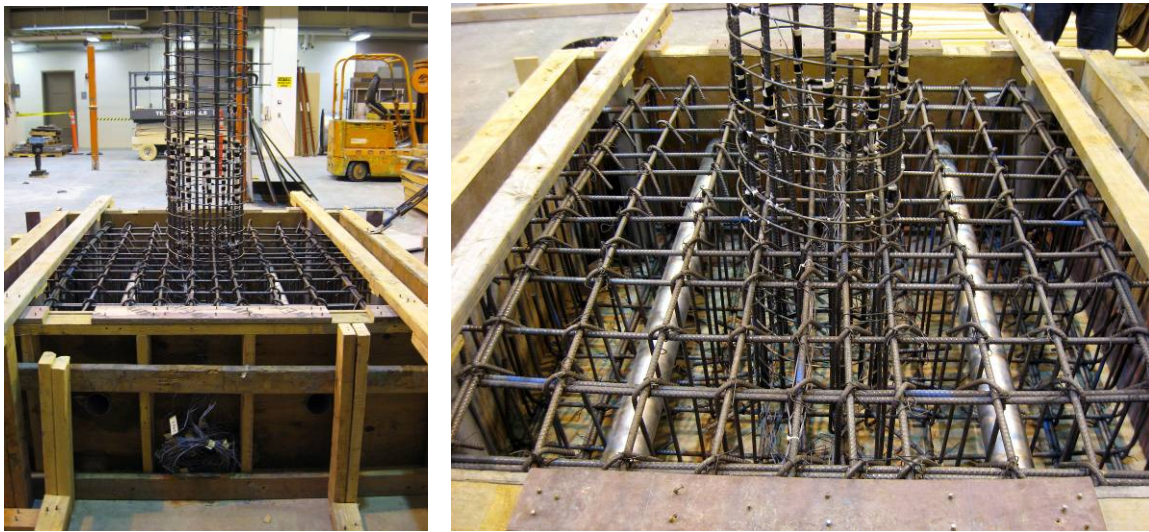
(a) Completed anchor block and column cage, specimen S1; (b) Horizontal and vertical cylinders in anchor block, specimen S1
